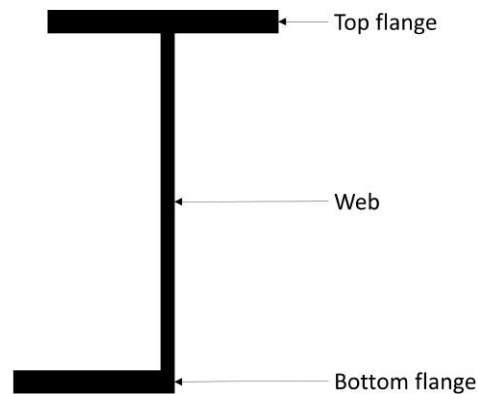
Sketch of a 'J-beam'. Note: not to scale
